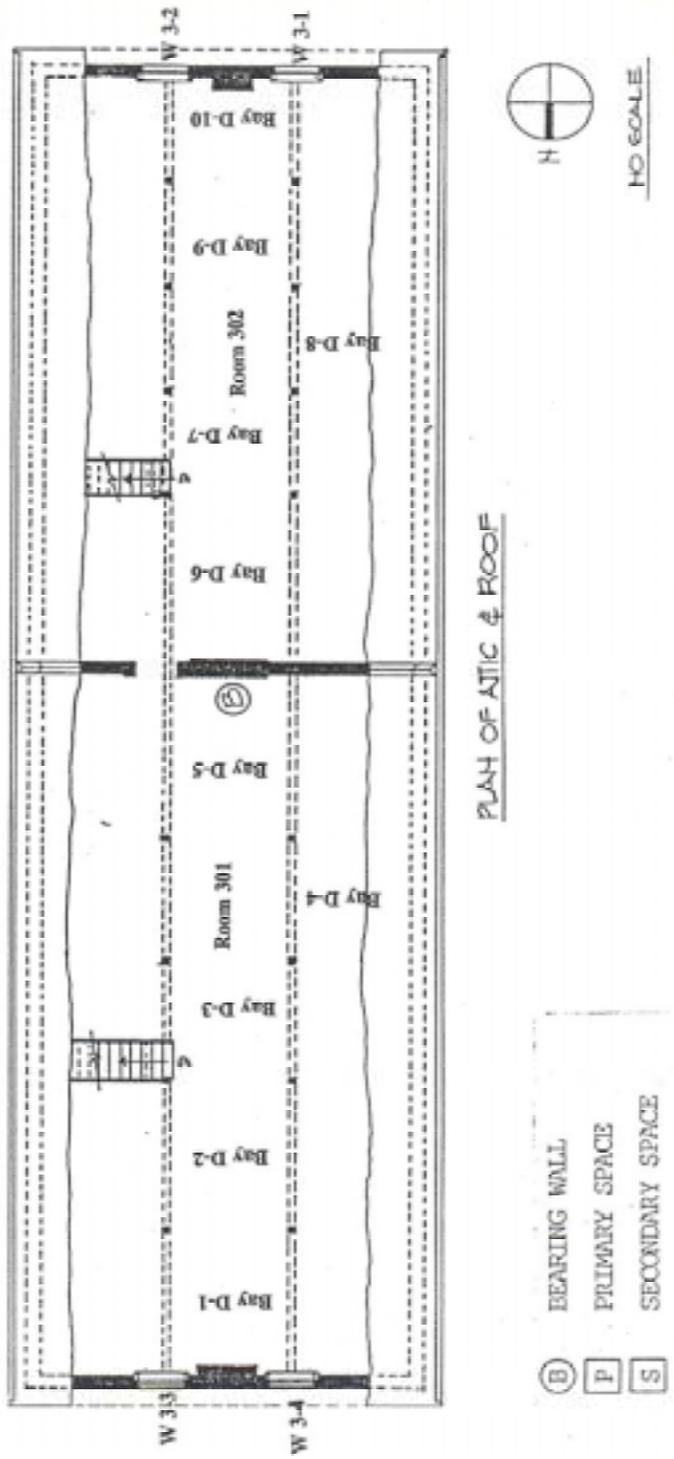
Attic plan of Building 32, showing scheduled rooms and openings [1988, annotated 1993].
